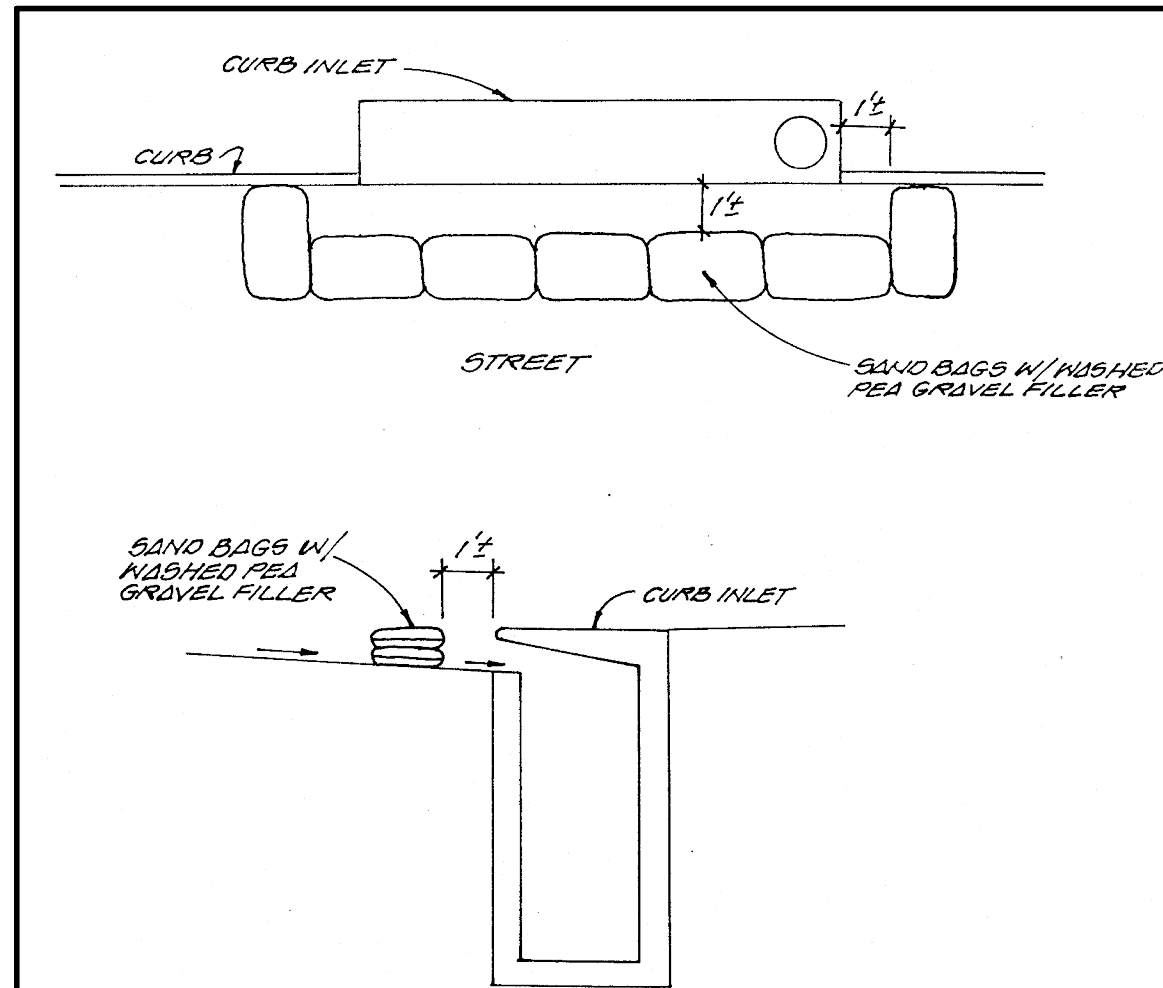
Diagram of Bagged Gravel Curb Inlet Protection (Pape-Dawson).
